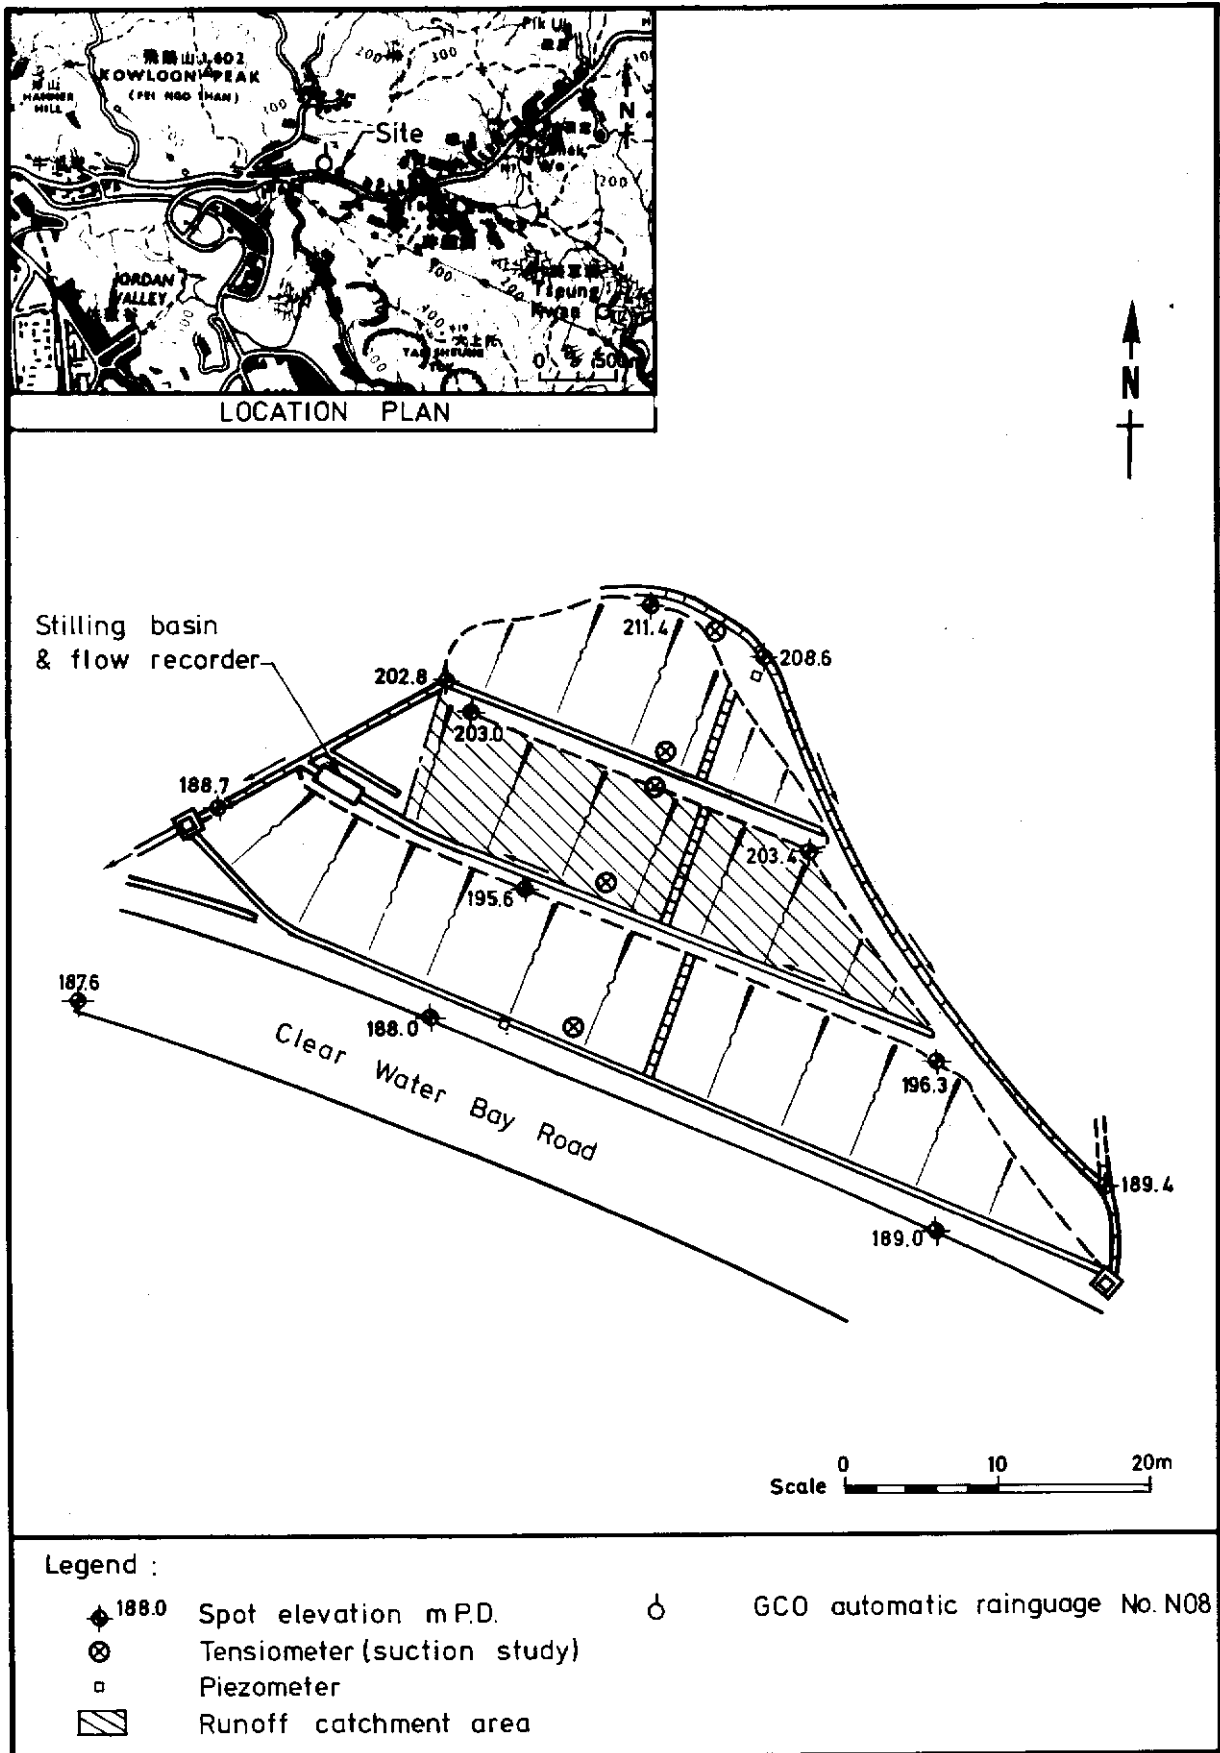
Site Plan for the Runoff Plot at Clear Water Bay Road (CWB)
